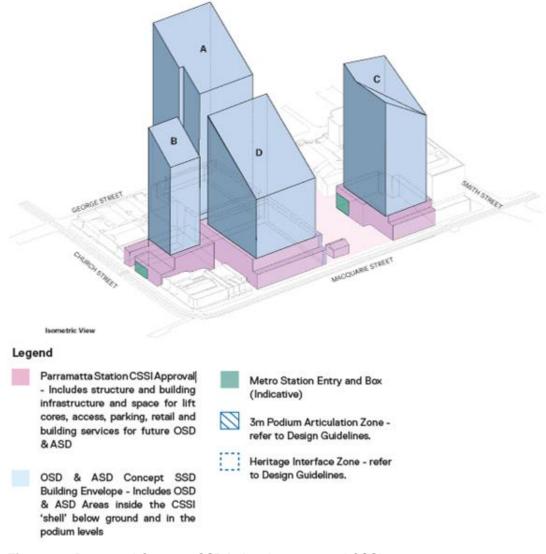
Proposed Concept SSDA development and CSSI scope
